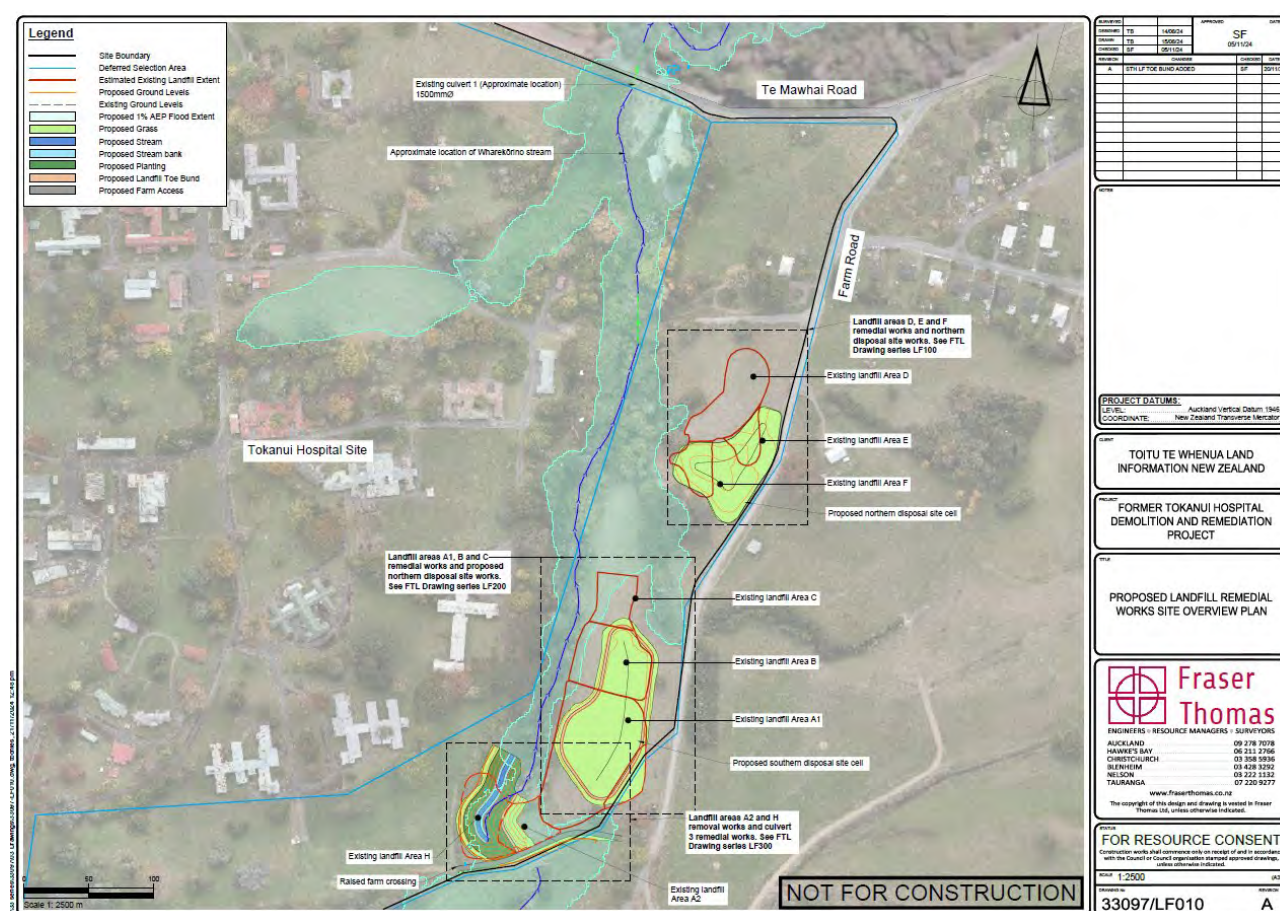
Proposed Landfill Remedial Works Site Overview Plan
